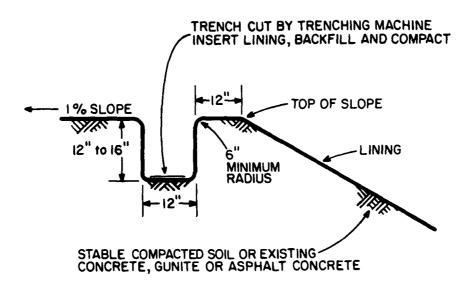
Schematic of anchor trench for membrane liner. (From H. E. Haxo, Lining of Waste Impoundment and Disposal Facilities.)
